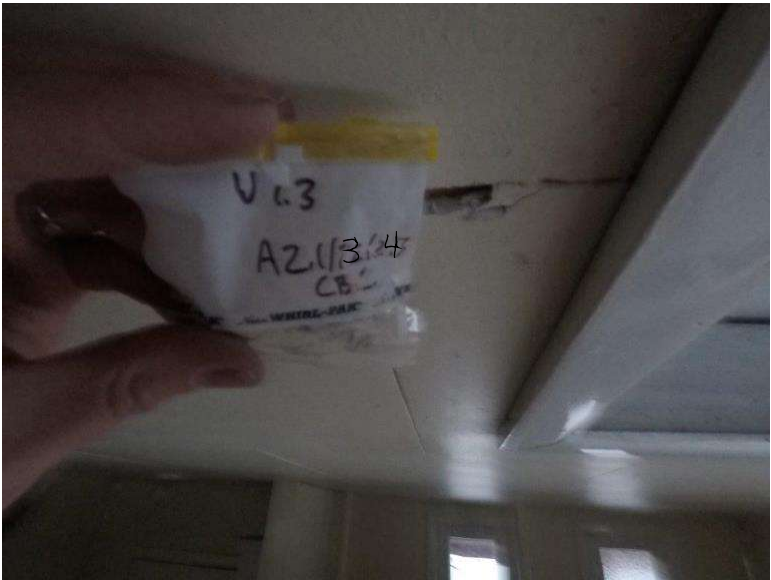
Site 7.3 Waterton Townsite Campground Washroom #8.
